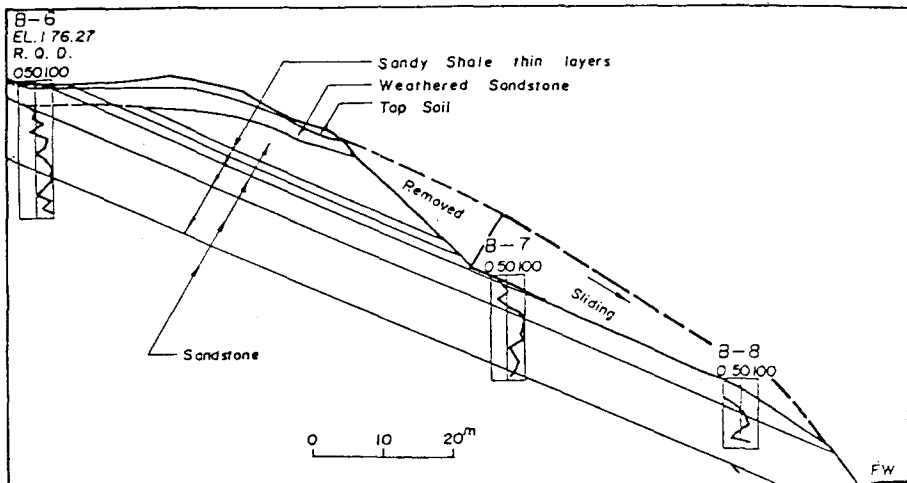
A Cross-Section of Failure Slope at 16 KN
